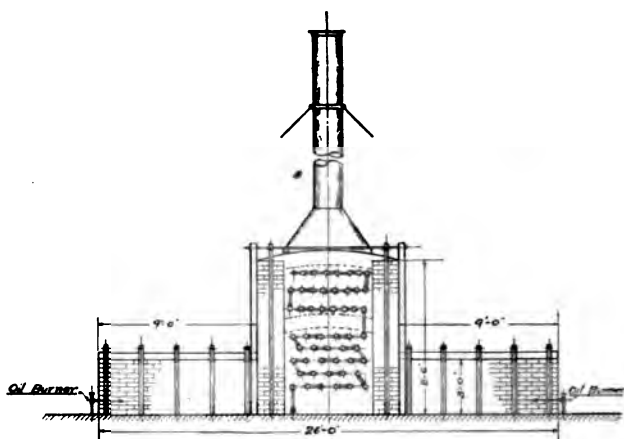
OIL-DEHYDRATING PLANT. END ELEVATION.
